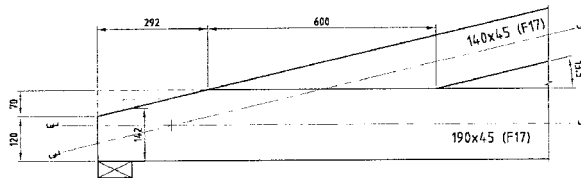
SKETCH OF ALTERNATIVE DOUBLE GIRDER TRUSS CONFIGURATION (FULLER BOTTOM CHORD)
